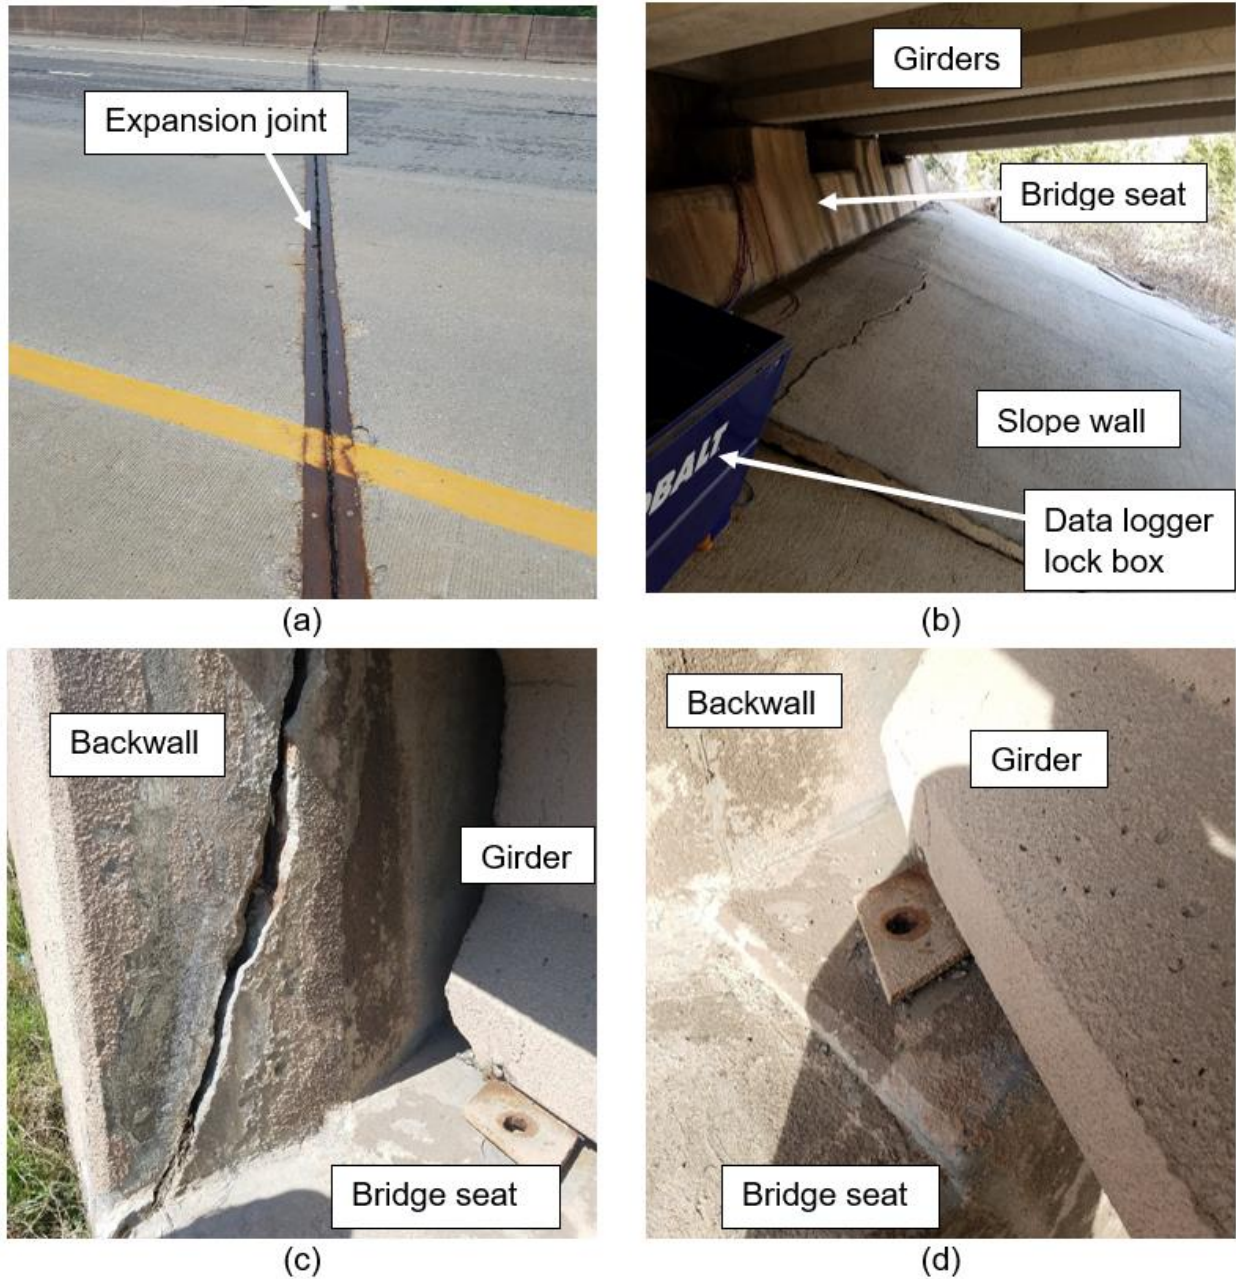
SH-3 over BNSF: Bridge distress (a) closed expansion joint, (b) buckled slope wall, (c) cracked backwall, (d) sheared anchor bolt
